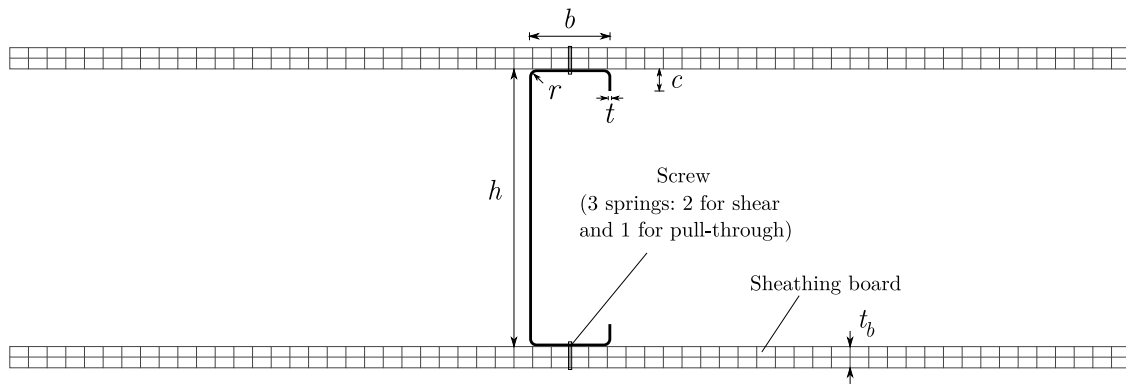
Cross-sectional notation of stud column and finite element discretisation of sheathing.
